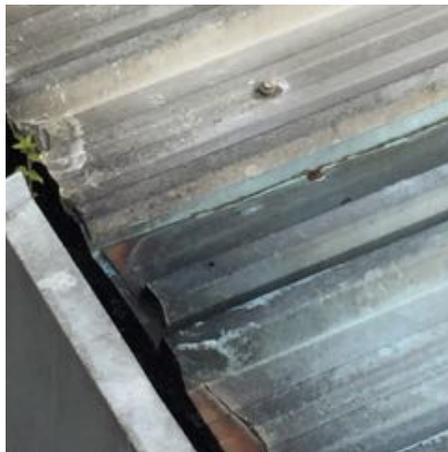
Cut edge corrosion at eaves level. Please note joint where roof coverings extended.
